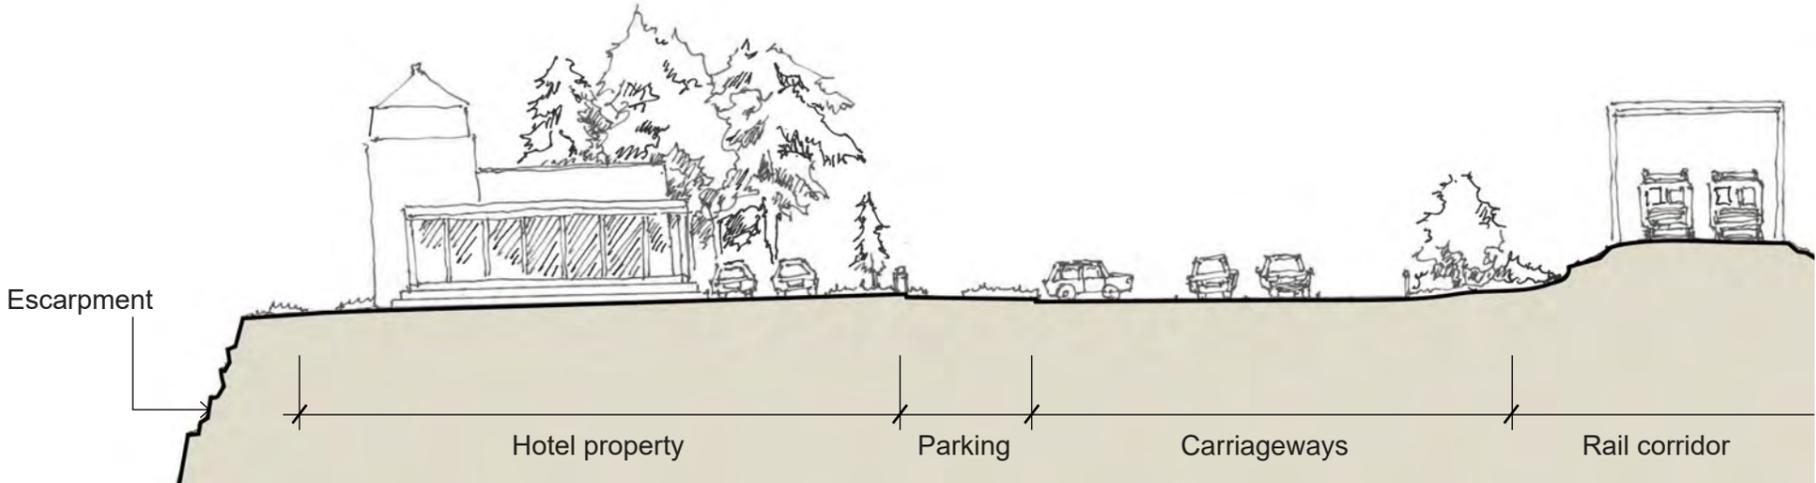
Existing situation - section through Hydro Majestic area showing young pines plantings against rail corridor
